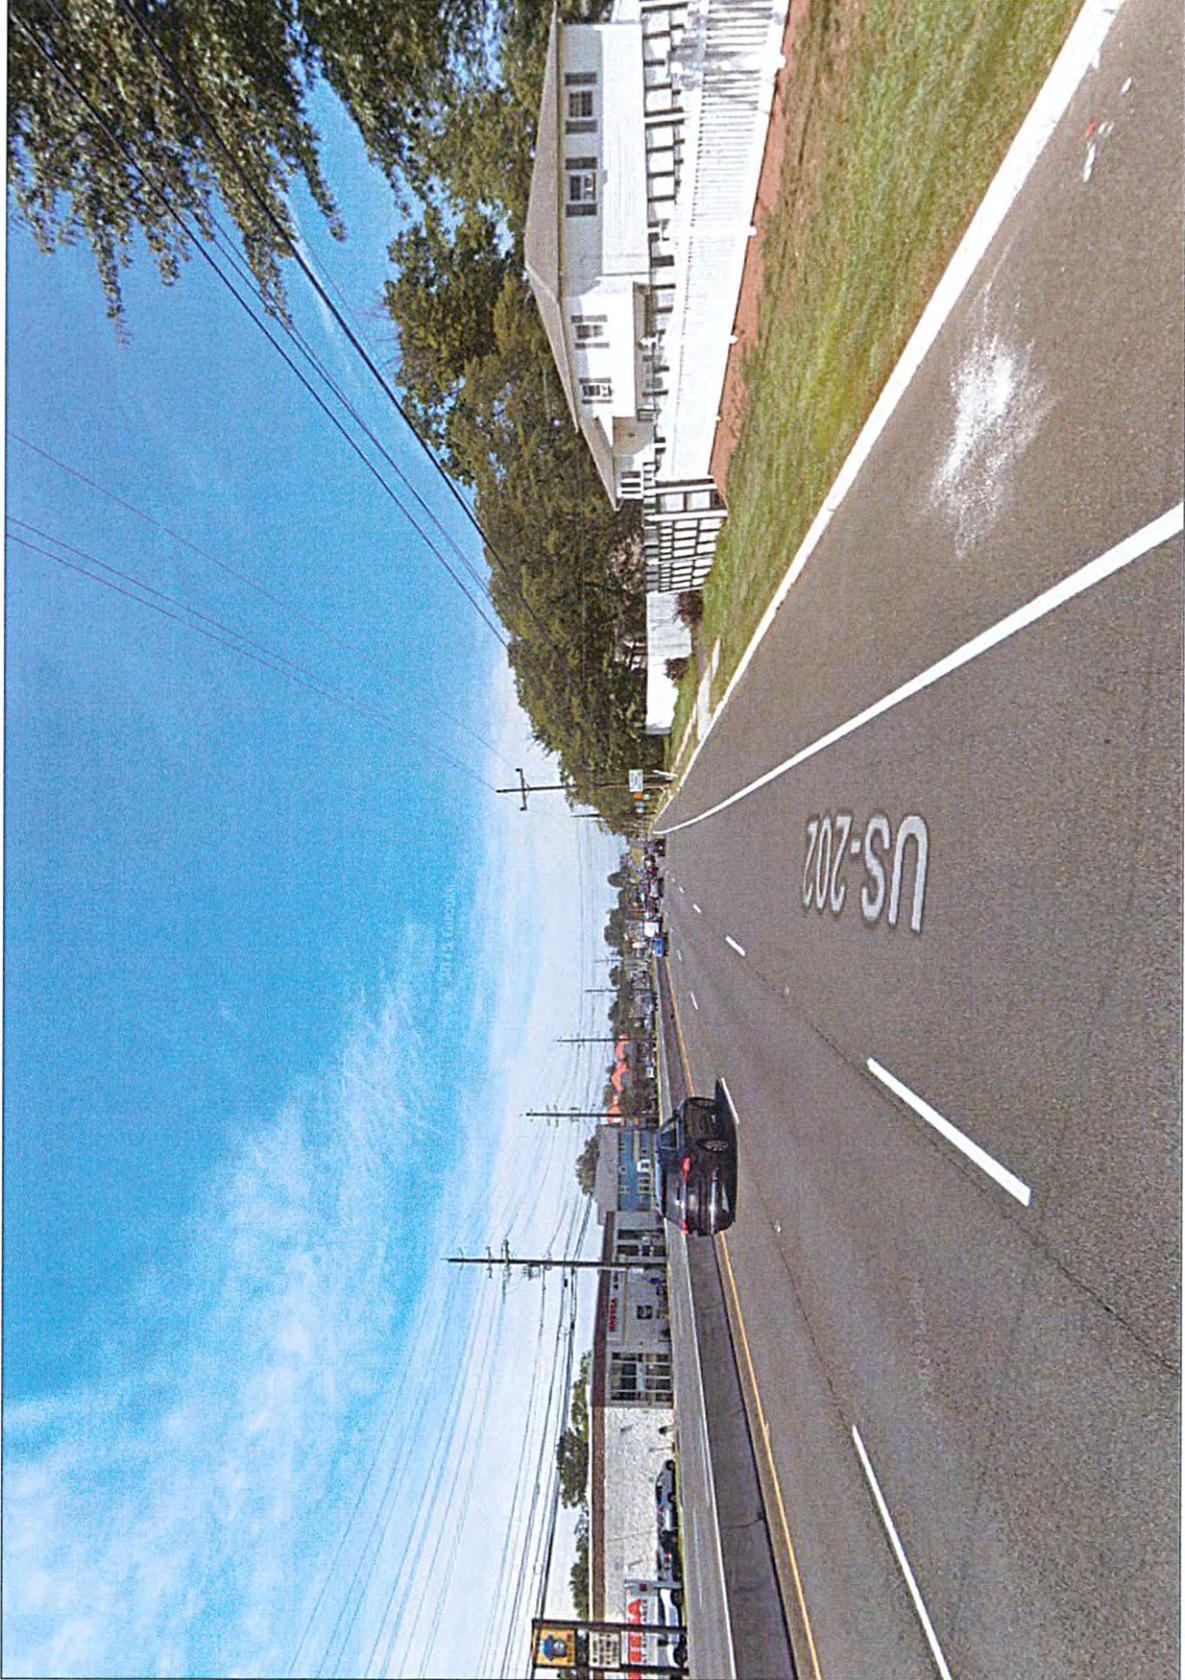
NJSH 202 SB. APPROXIMATELY 800 FEET NORTH OF PROPOSED SIGN
